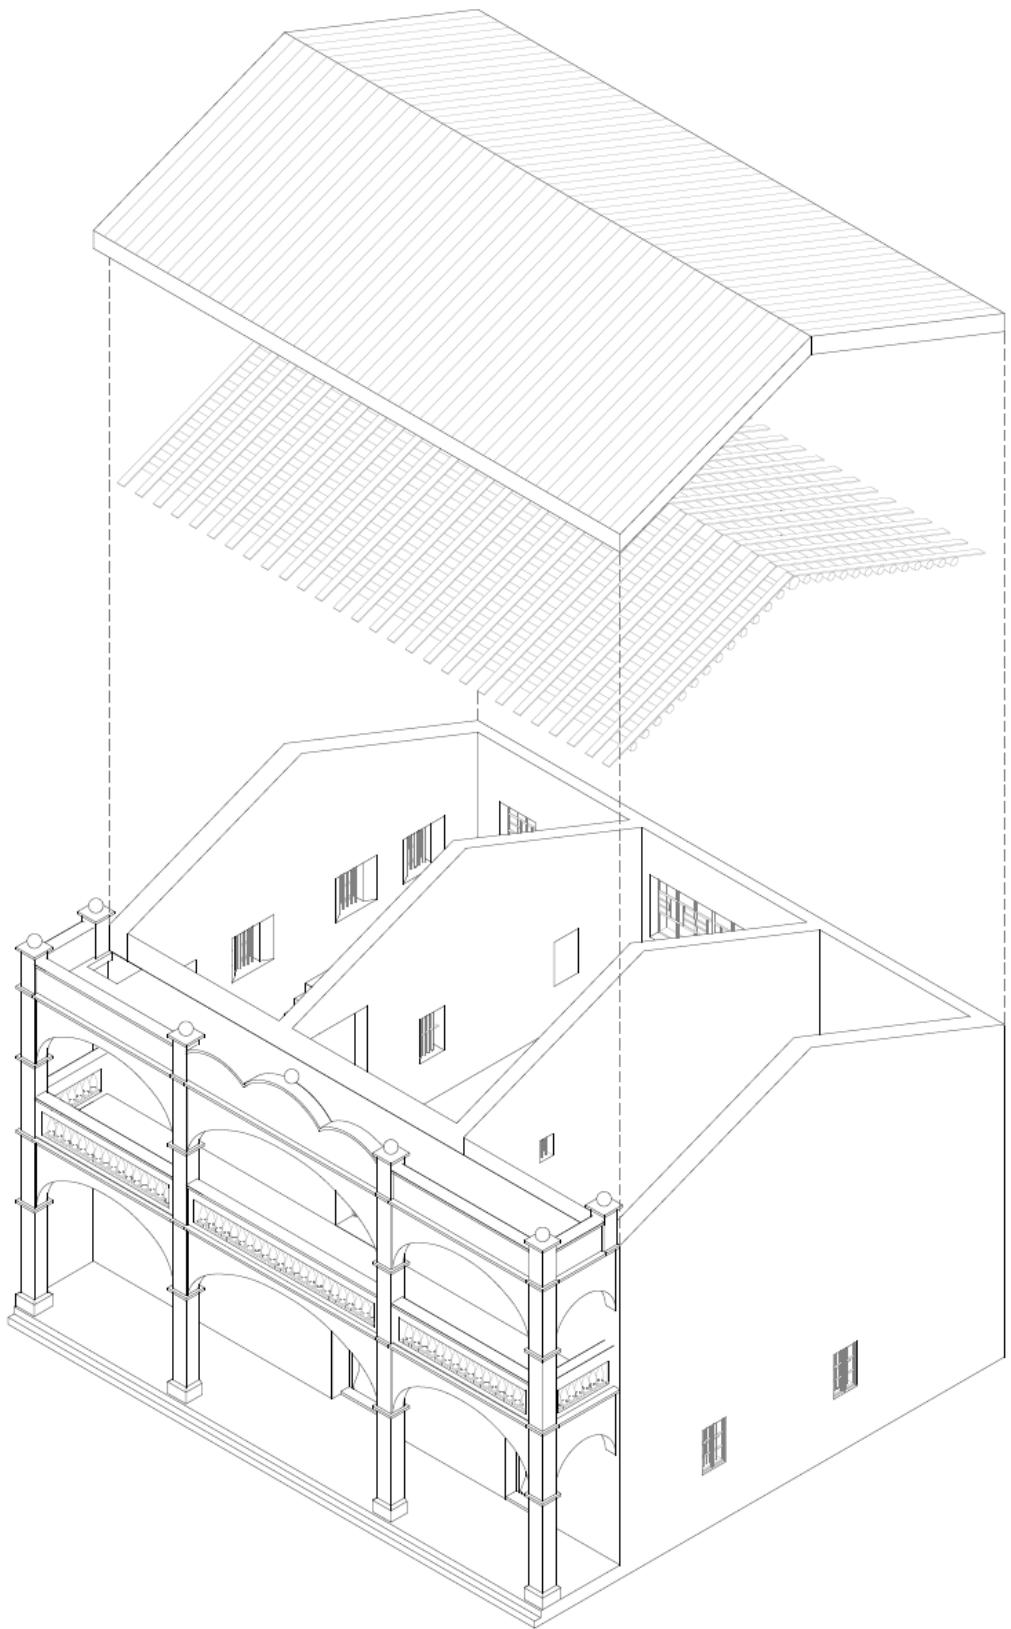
Exploded isometric drawing of Kai Choi School
